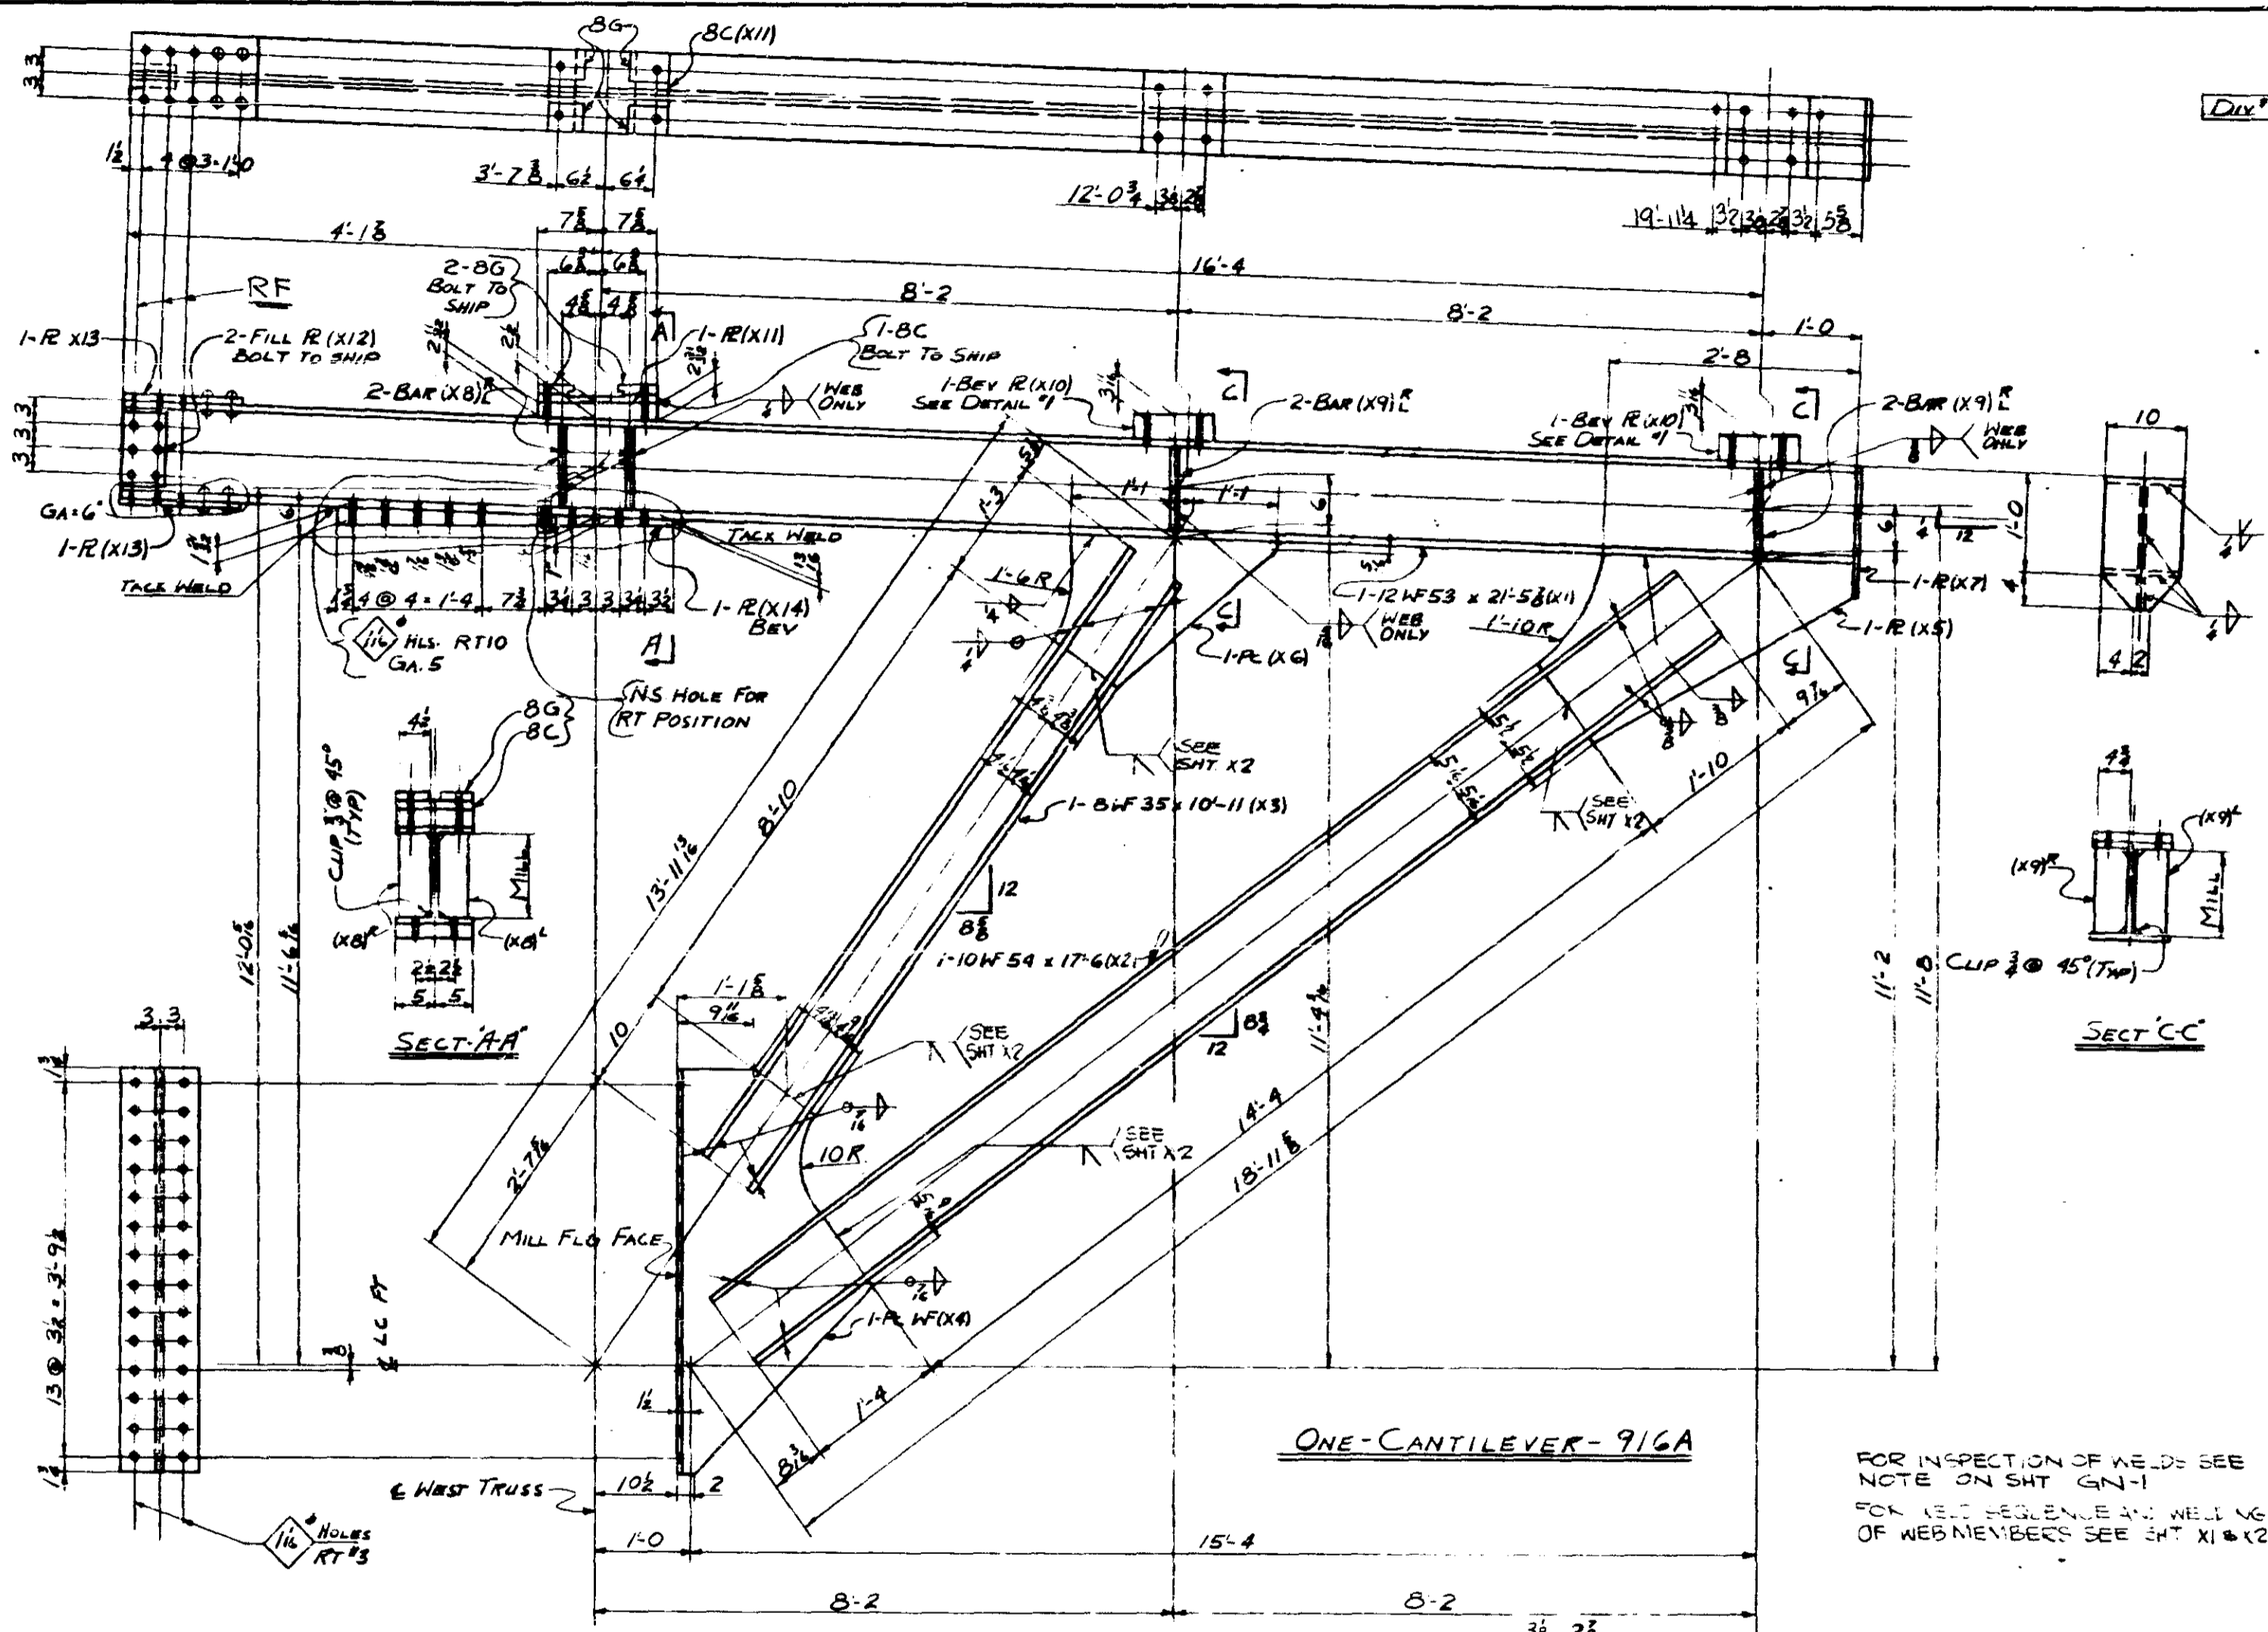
DETAILS OF CANTILEVER @ FT#3 (EAST TRUSS)
